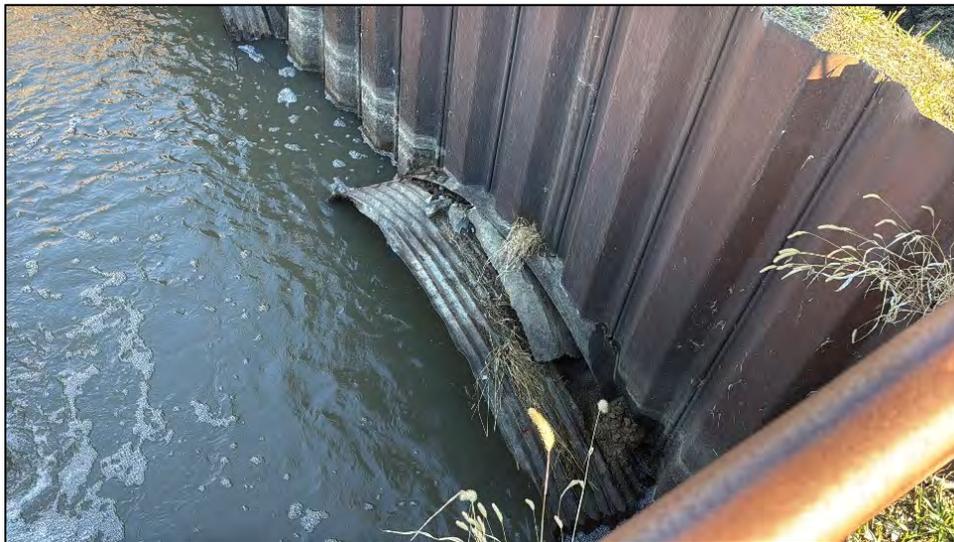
Closeup of upstream end of south culvert. The culvert is submerged by Beaver Lake permanent pool, limiting visibility of the crushed section of 96" corrugated metal pipe.
